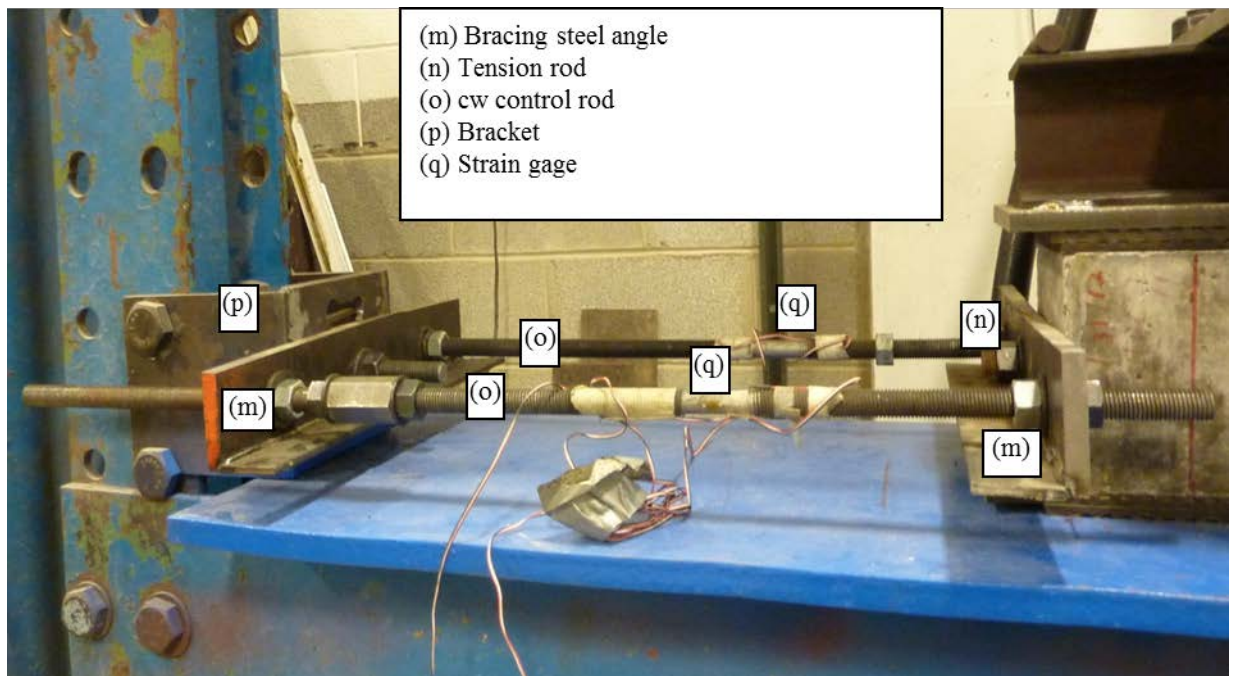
Crack width control assembly on the left hand side of the beam.
